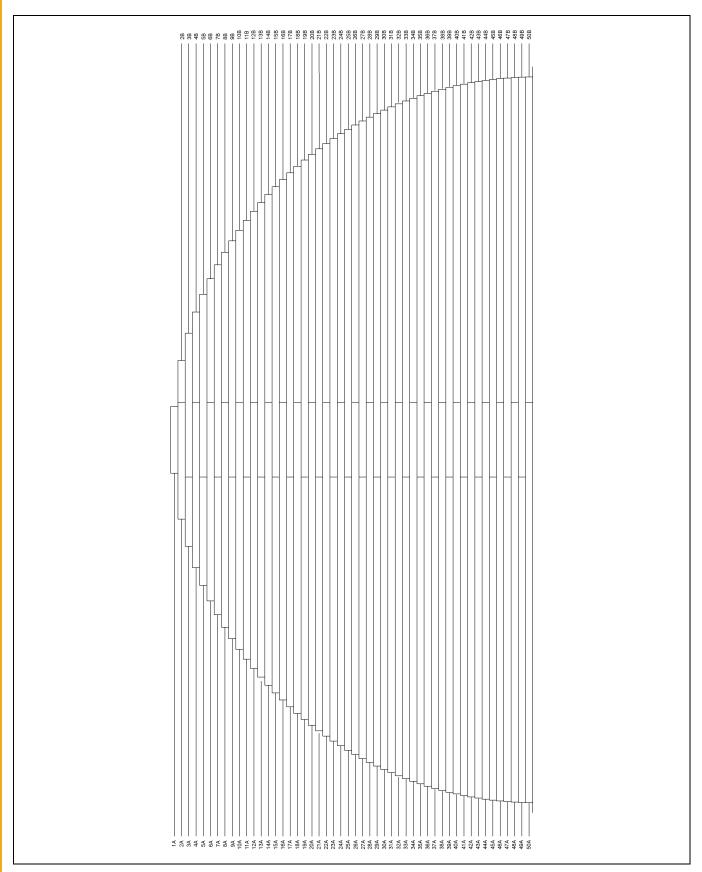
F Plank Layout for 60' Diameter Bin Recessed Full Floor
